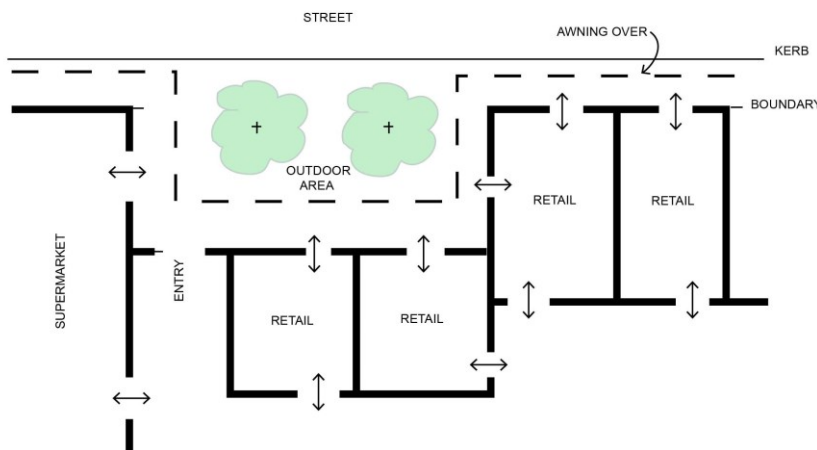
Outdoor trading area at entry to a stand alone shopping centre
